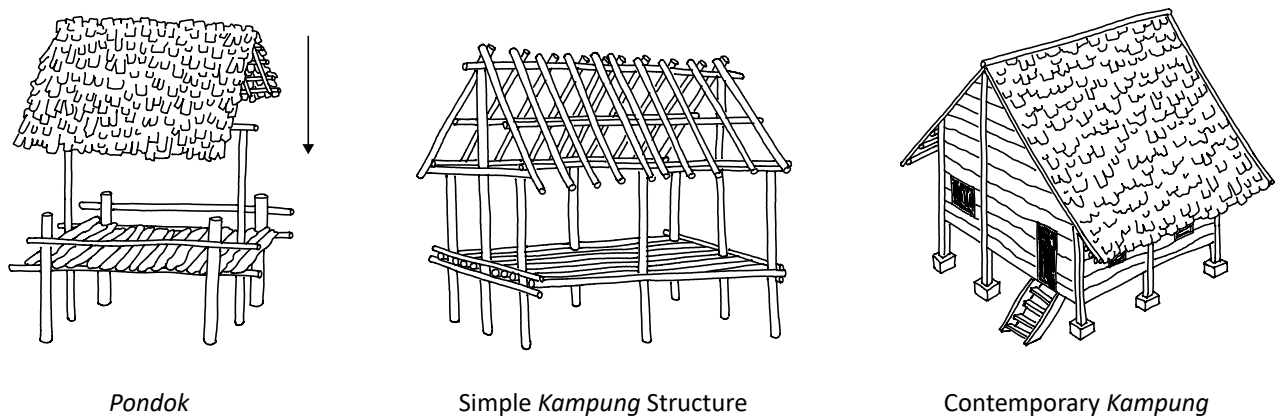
Illustrations of Pondok and Kampung Dwellings (adapted from Schefold et al., (2008)- Alastair Brook 2023
